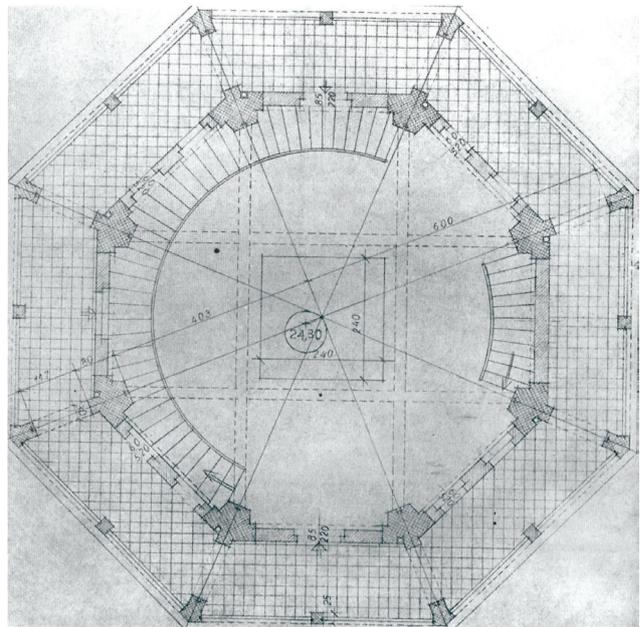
P. Zanini, Plan of the bell tower at elevation m 24.30. Zanini Archive, Civici Musei, Udine.
